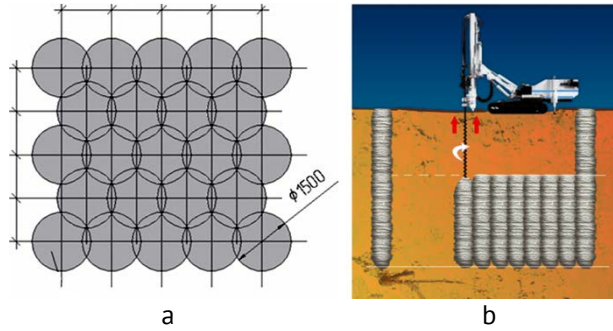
Soil-cement buried wall in the bottom part of a MS: a – plan view, b – installation of the soil-cement wall
